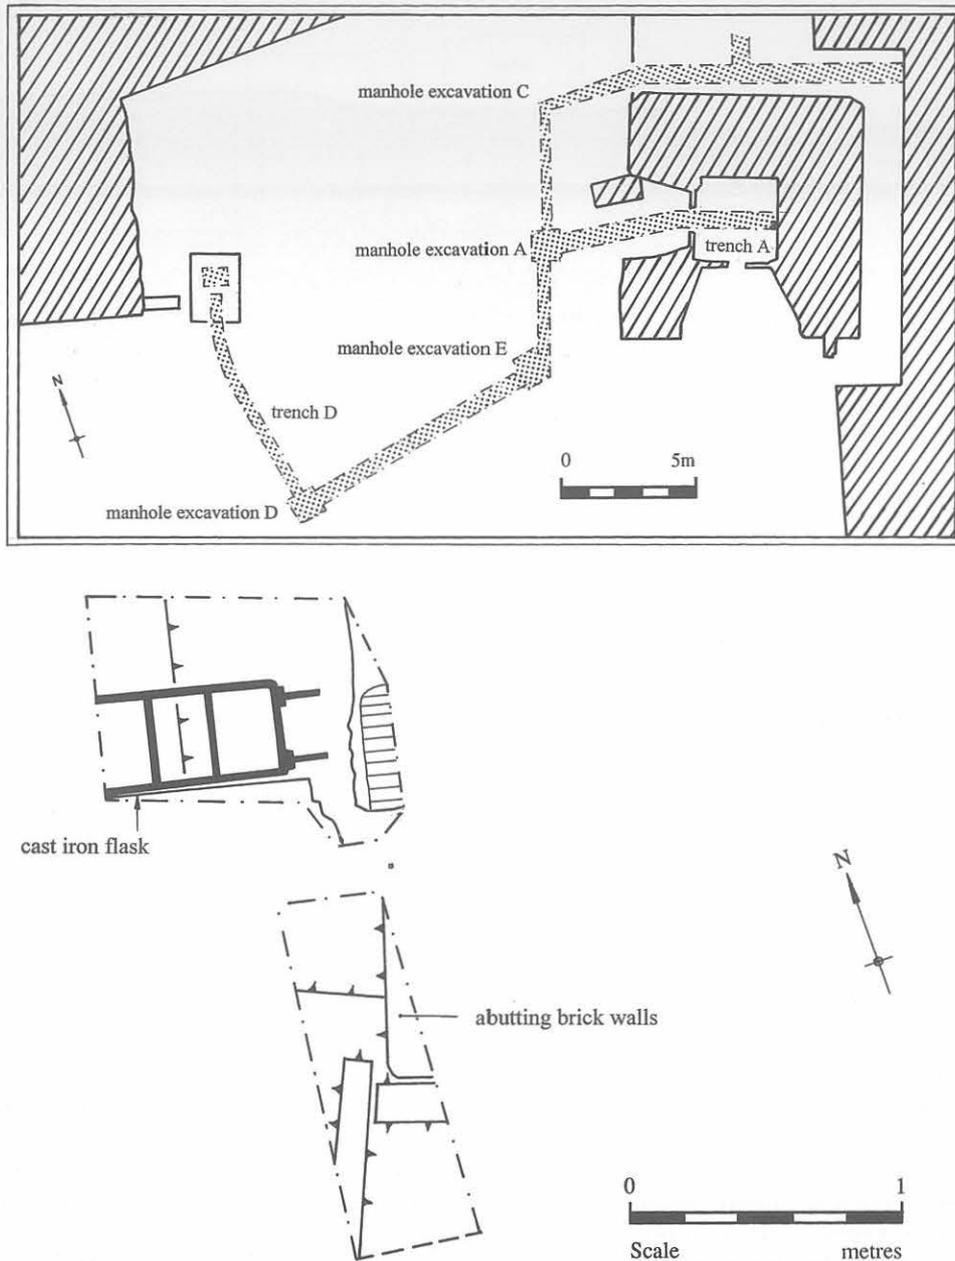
Drainage trenches excavated between the charging platform and the snapper furnace, revealing abutting walls of the foundry buildings and a cast-iron flask from the foundry.
